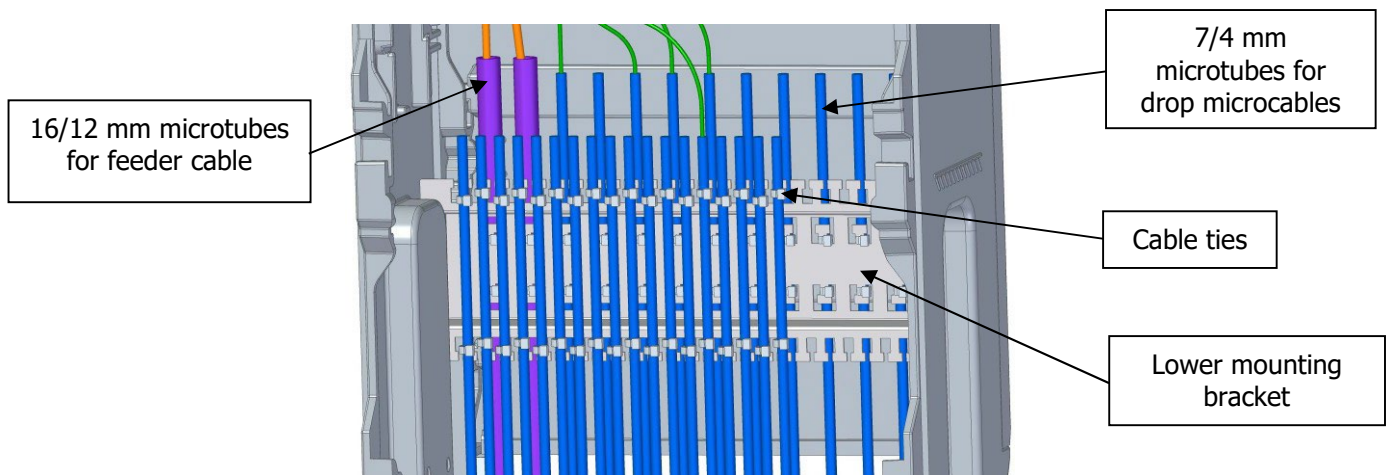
Installation of microduct layer closer to the cabinet front (front covers removed)
